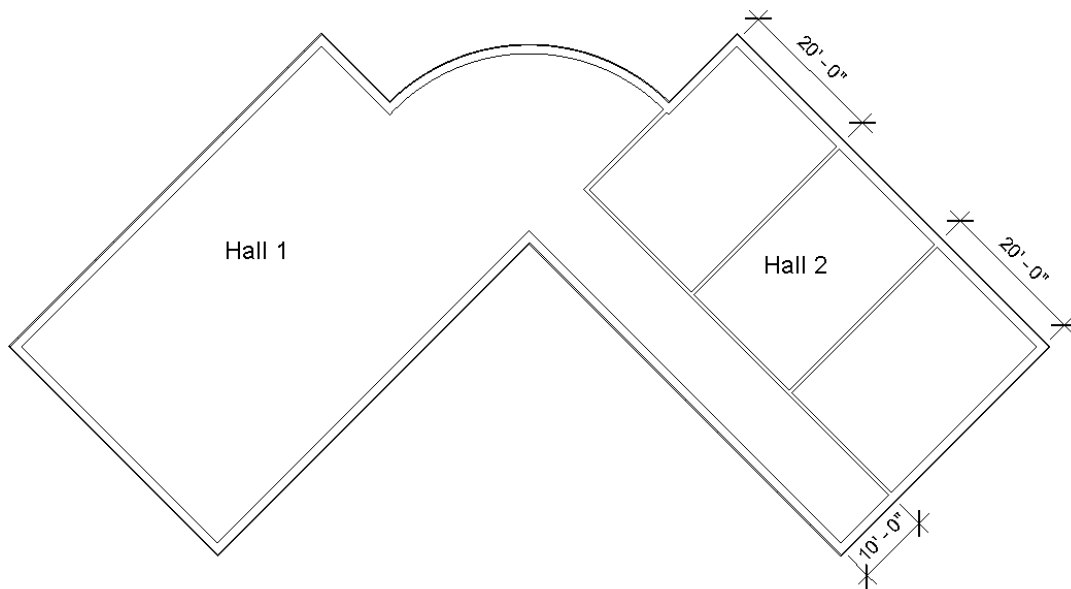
Sketch plan for sketching the interior walls of right portion for the *Club* project
